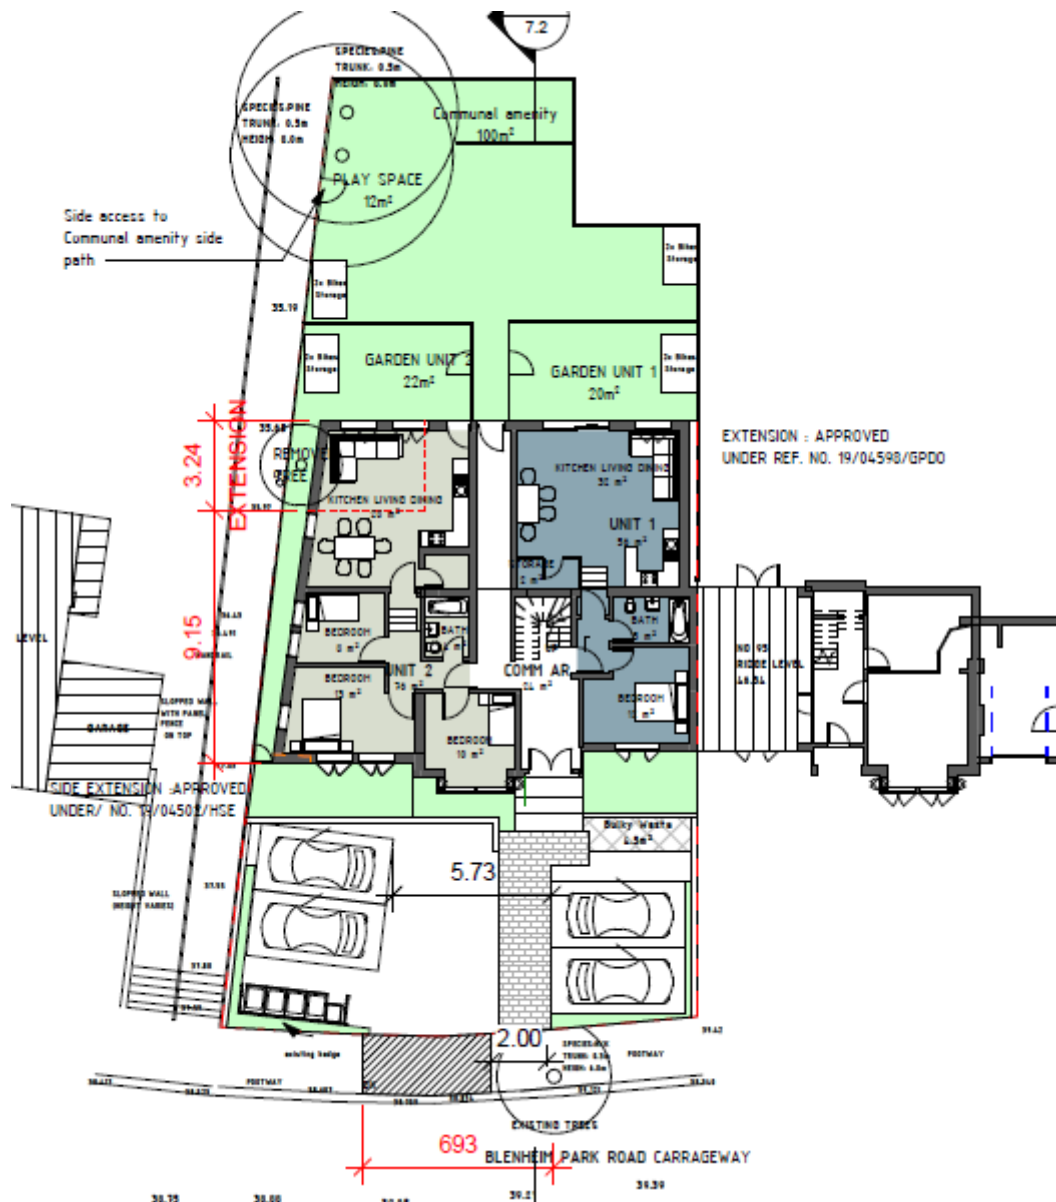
Proposed site plan showing proposal in relation to neighbouring properties
